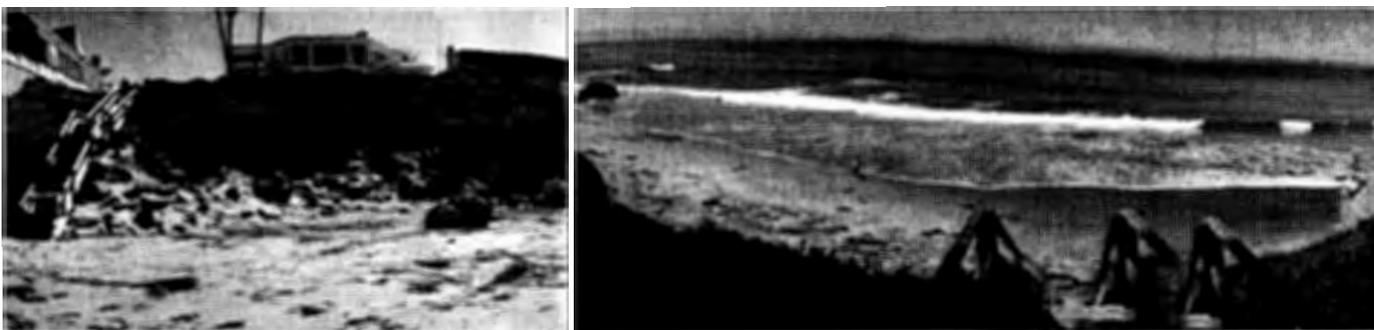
CLOSED WOODEN STAIRCASE AT FIRST STREET, FARTHER SOUTH OF CAYUCOS PIER.
